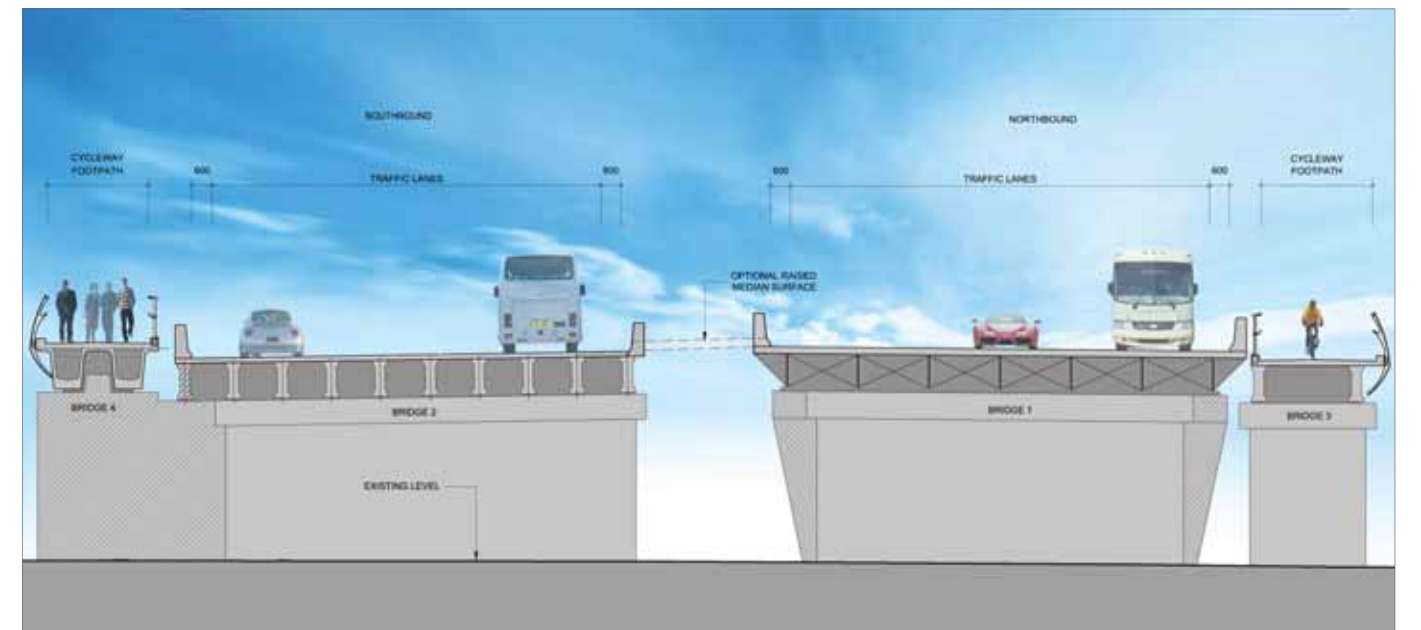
Future cross-section of Te Atatu Road bridges, looking south
